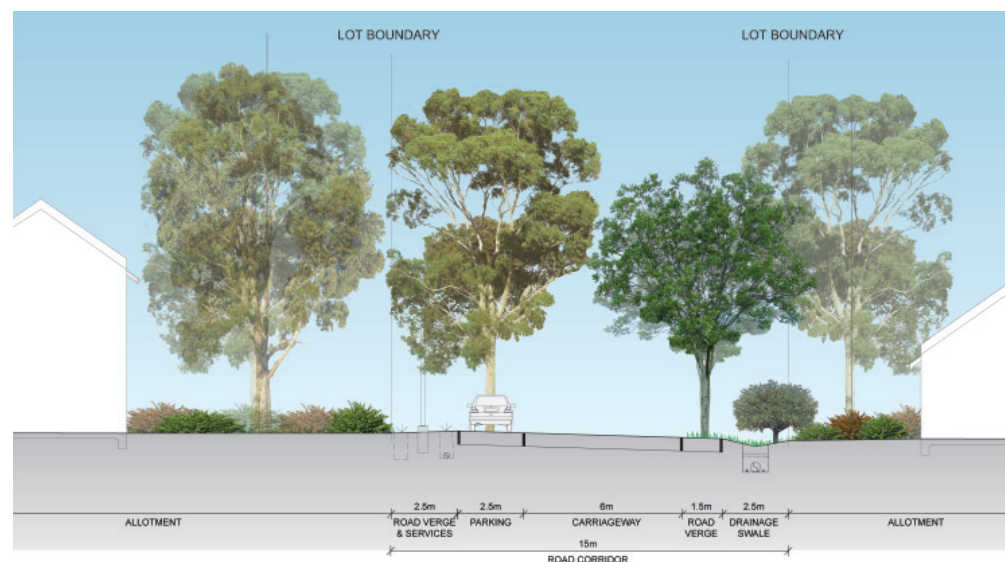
Section C-C through 15 metre Wide Local Road - With Parking.
